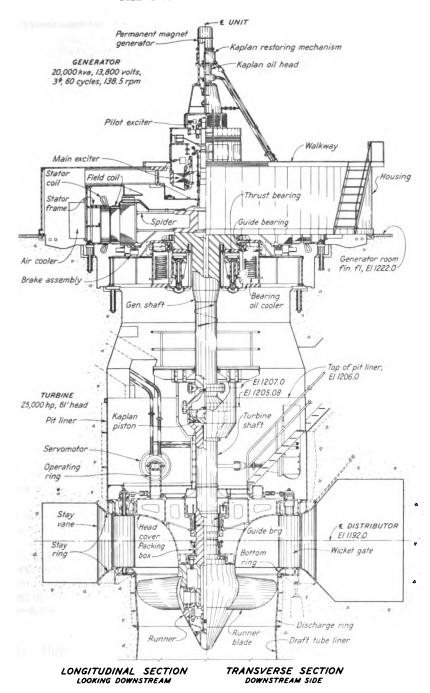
Fort Patrick Henry—turbine and generator sections.
